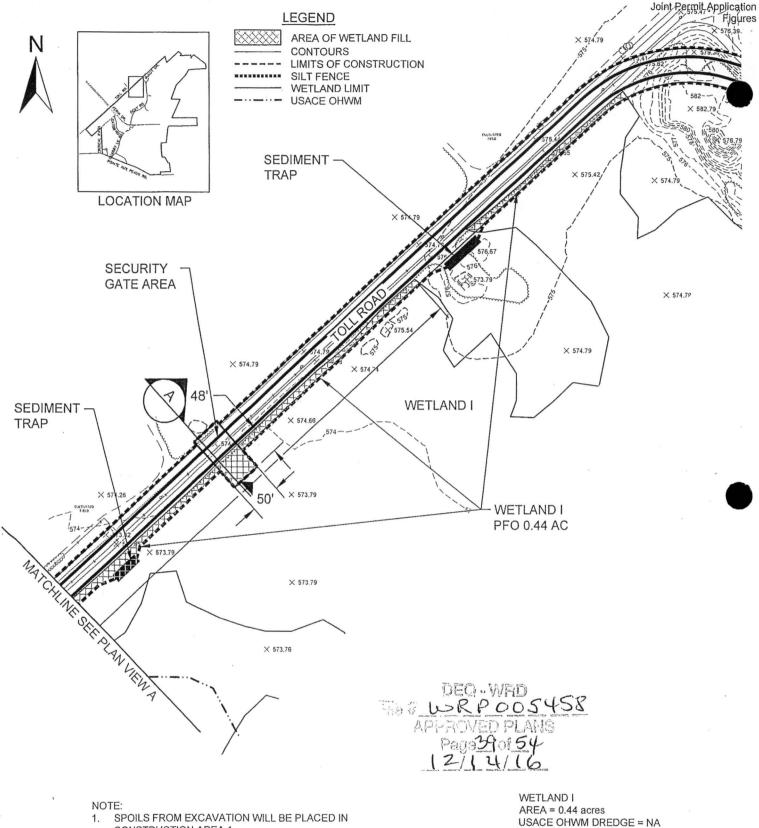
A NEW OPERATIONS ACCESS ROAD PLAN VIEW A
